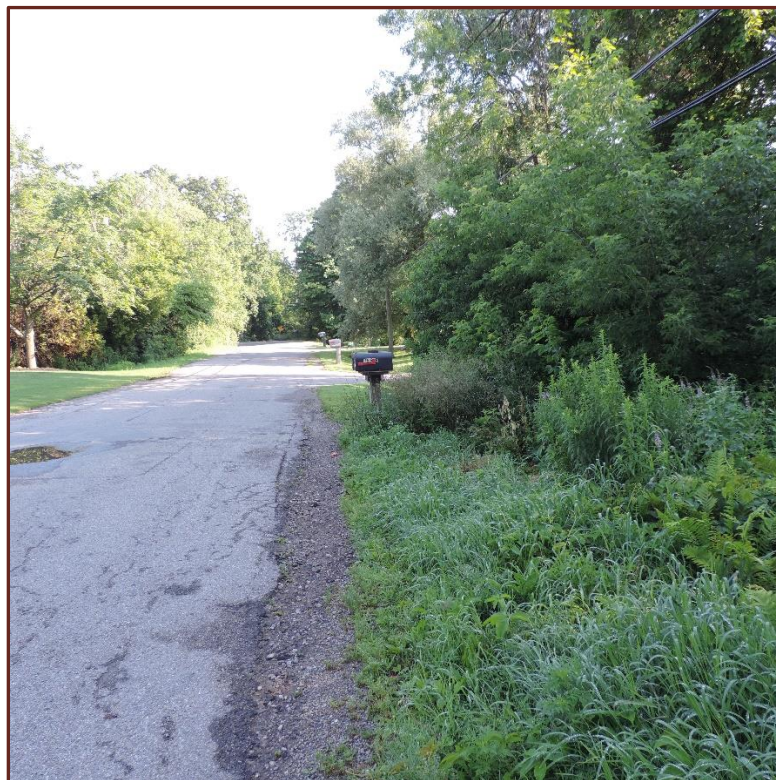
Looking north the area between the property and Robinson Road without a define ditch.
